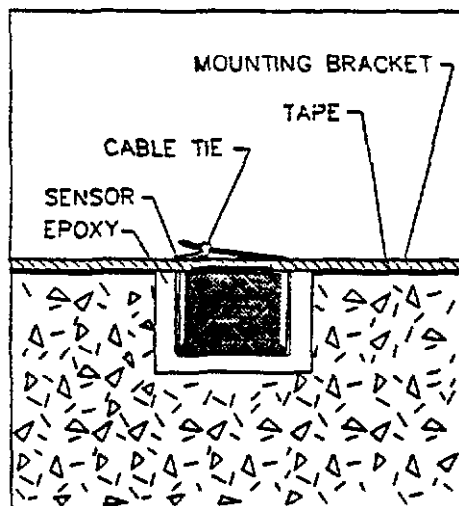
Cable ties are used to hold the sensor to the mounting bracket
